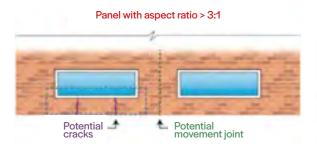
A long uninterrupted run of brickwork between upper and lower windows can lead to cracking at the smallest height, i.e. between the windows either as shown or from the corners of the windows. Cracks may be vertical or stepped - they follow the line of least resistance.
